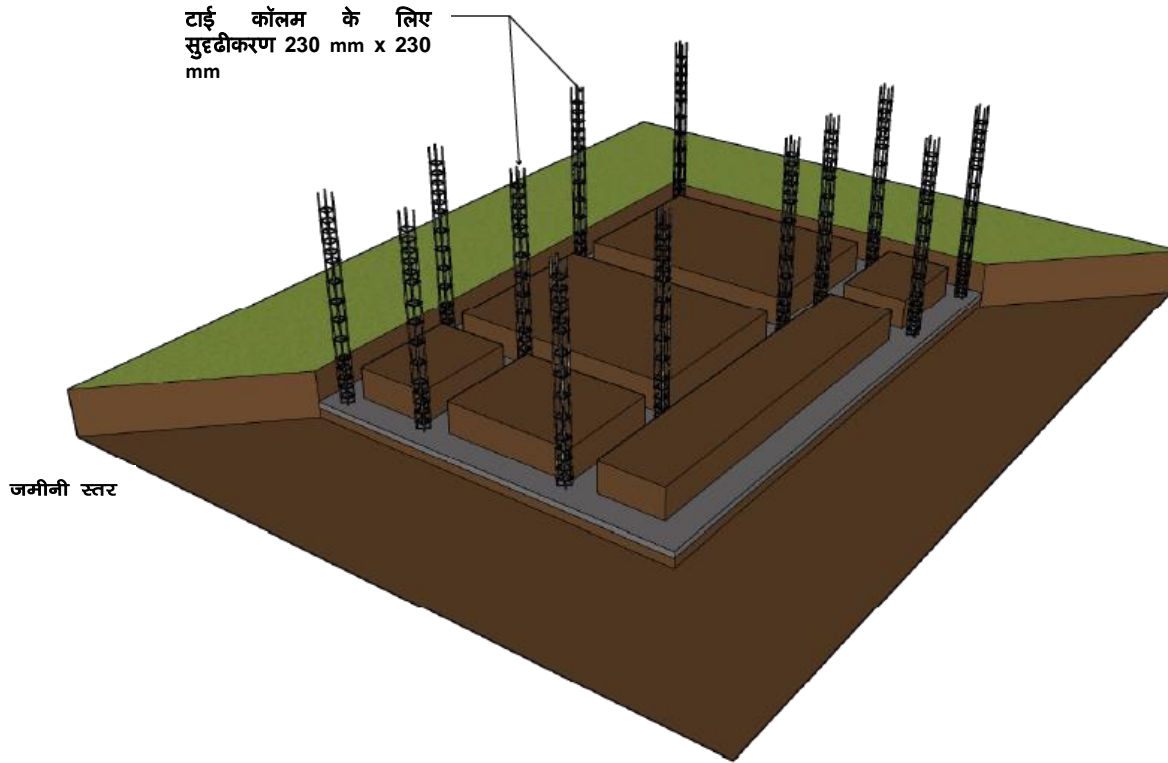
The figure shows foundation trenches with location of the Tie columns and RCC columns of the main hall.
